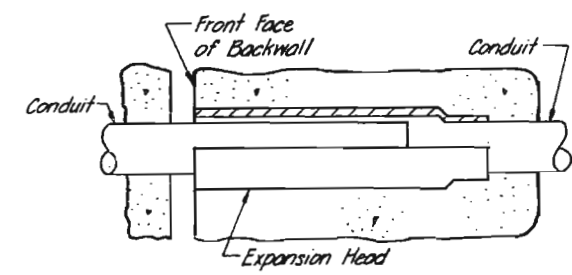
DETAILS OF CONDUIT AT ABUTMENTS NO. 1 & 3 (EAST WING)
